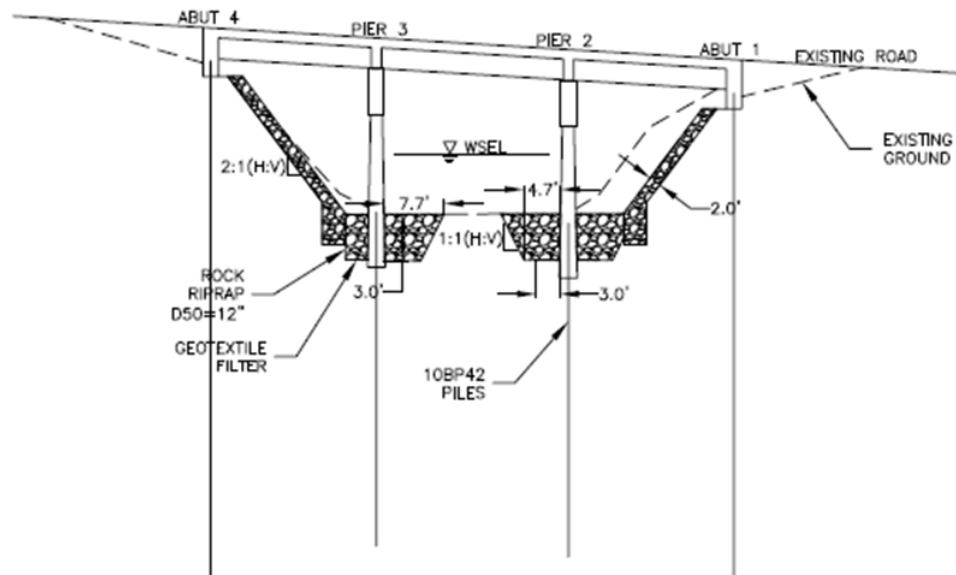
Cross-sectional view of Bridge A-15-Z with recommended hydraulic scour countermeasures
